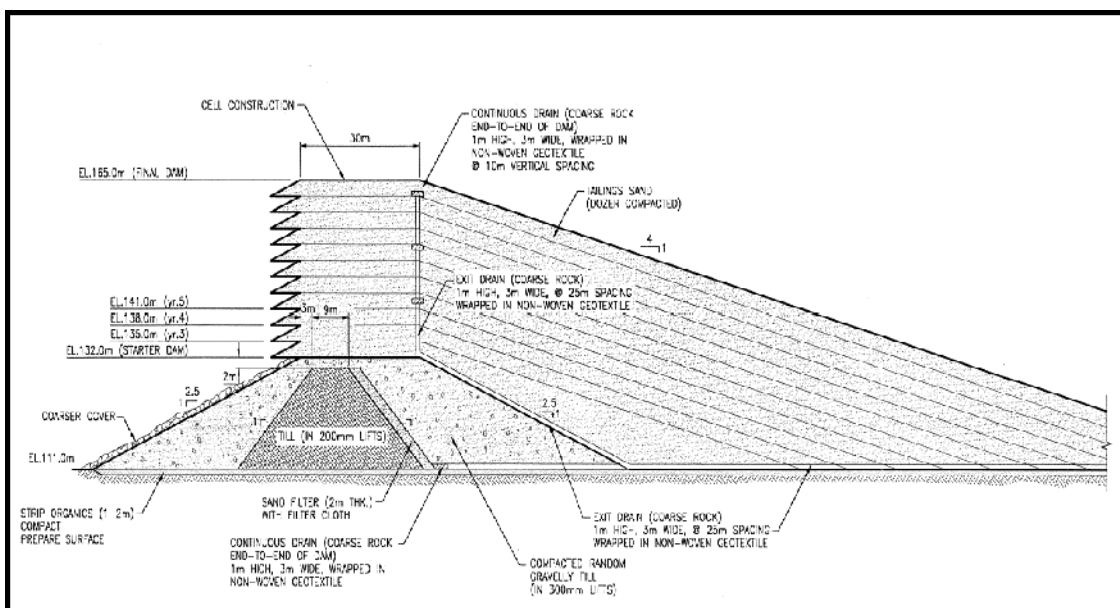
A Cross Section of the Main Dam (Piteau 1997)
